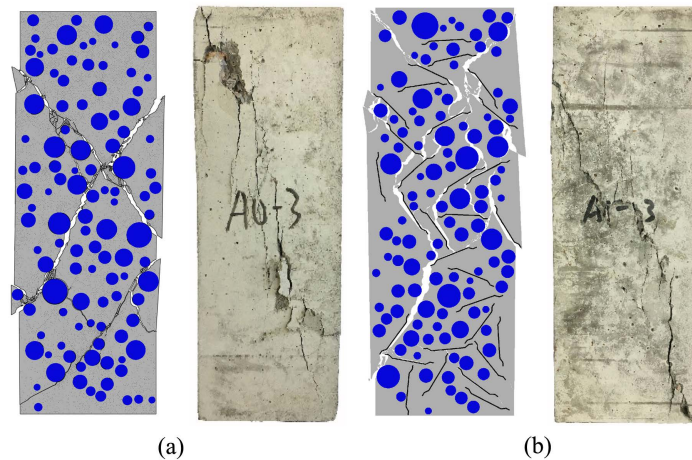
Failure modes of the numerical specimen and an experimental specimen. (a) Normal concrete; (b) HES fiber reinforced concrete.
